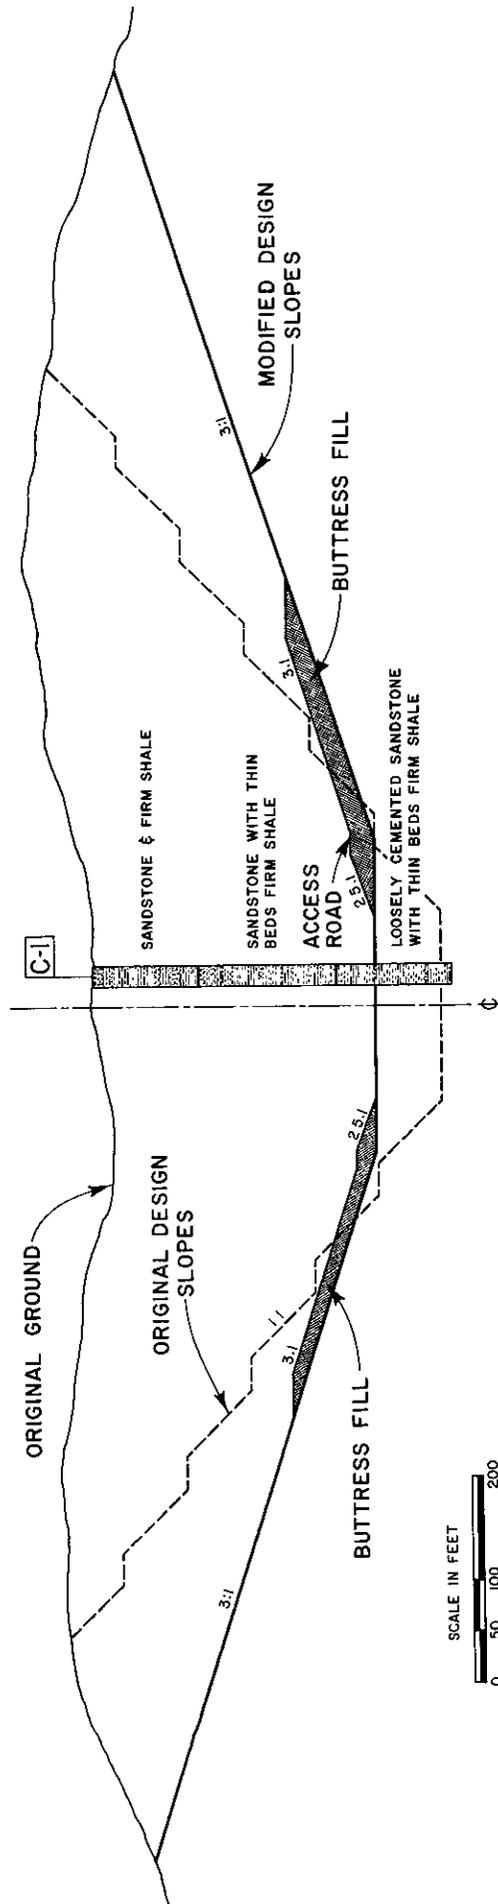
FIG. II TYPICAL SECTION OF MULHOLLAND CUT SHOWING ORIGINAL AND MODIFIED DESIGN
